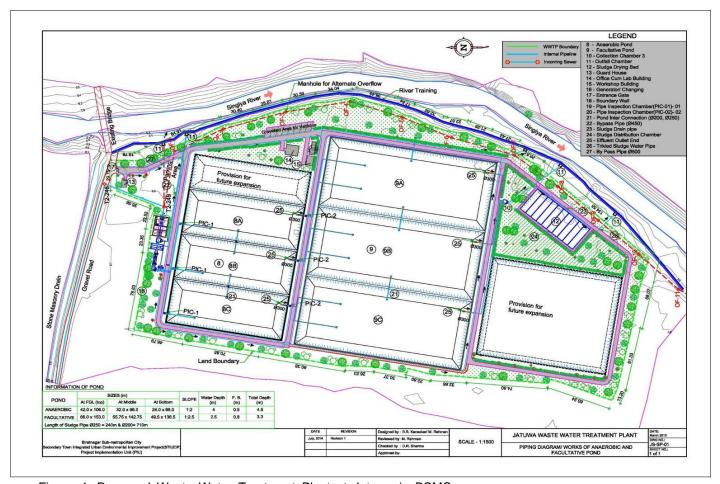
Proposed Waste Water Treatment Plant at Jatuwa in BSMC
